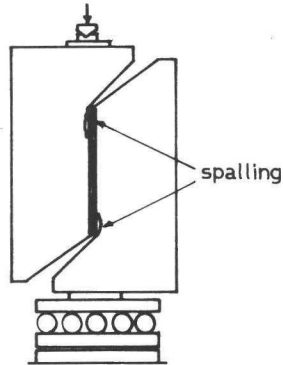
Local spalling in some of the heavily reinforced specimens
